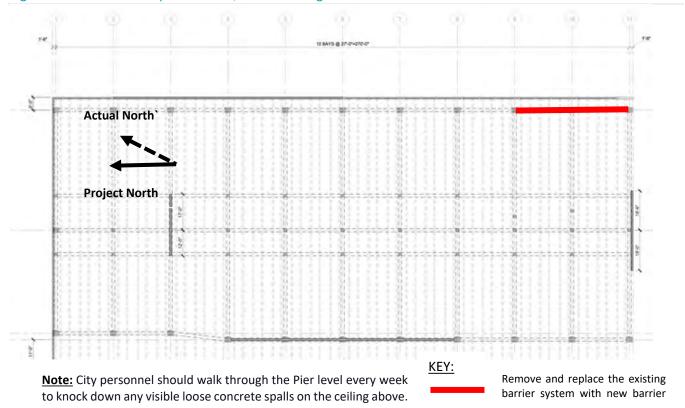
Immediate Repair location, North Parking Pier Structure – Pier Level
